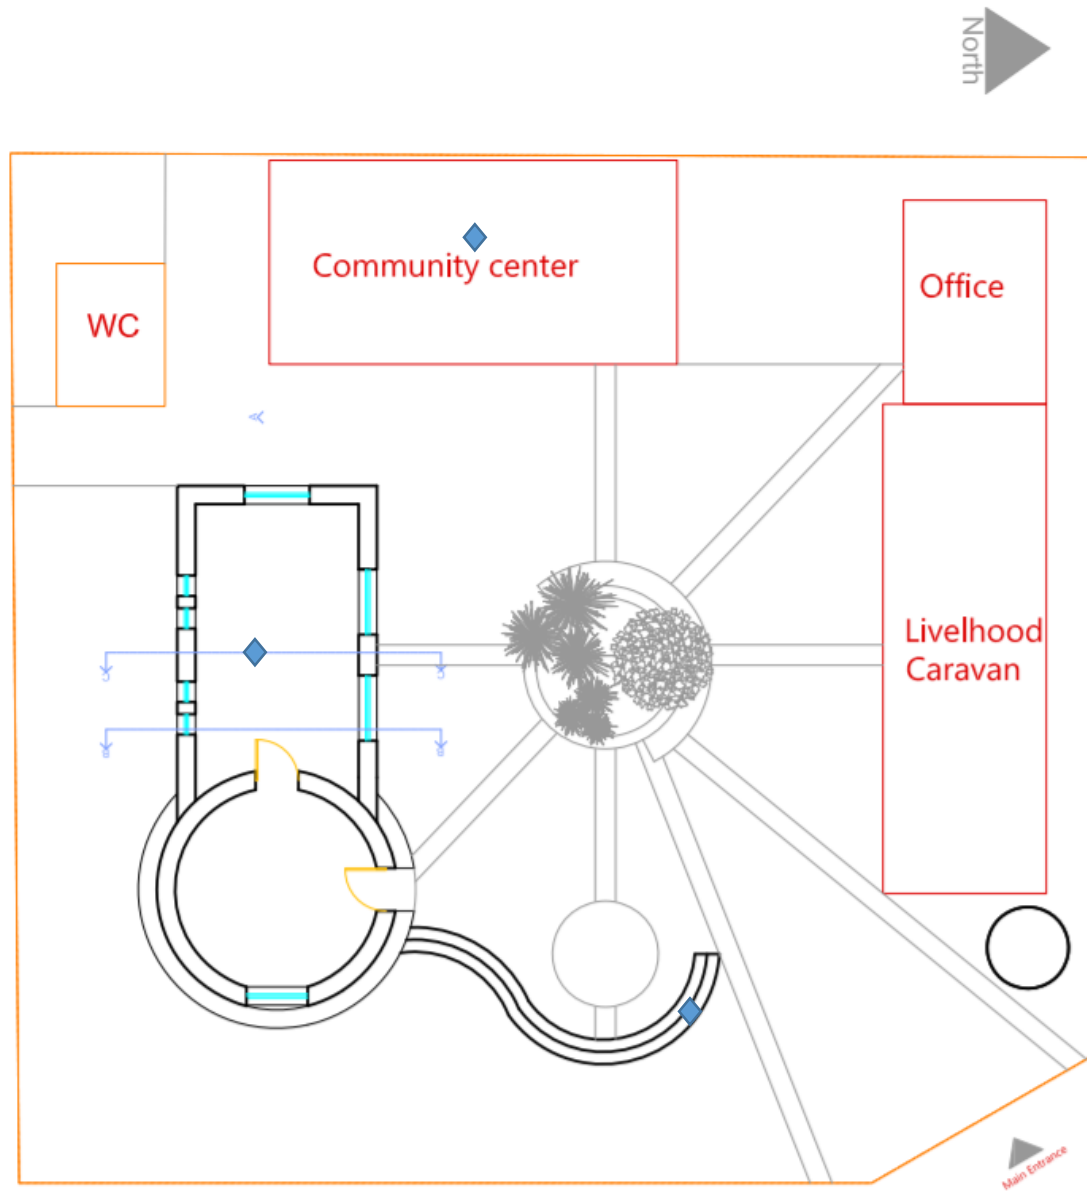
Site plan, location of dust monitor indicated by blue diamond. Drawing credit: Haneen Abumahfouz
